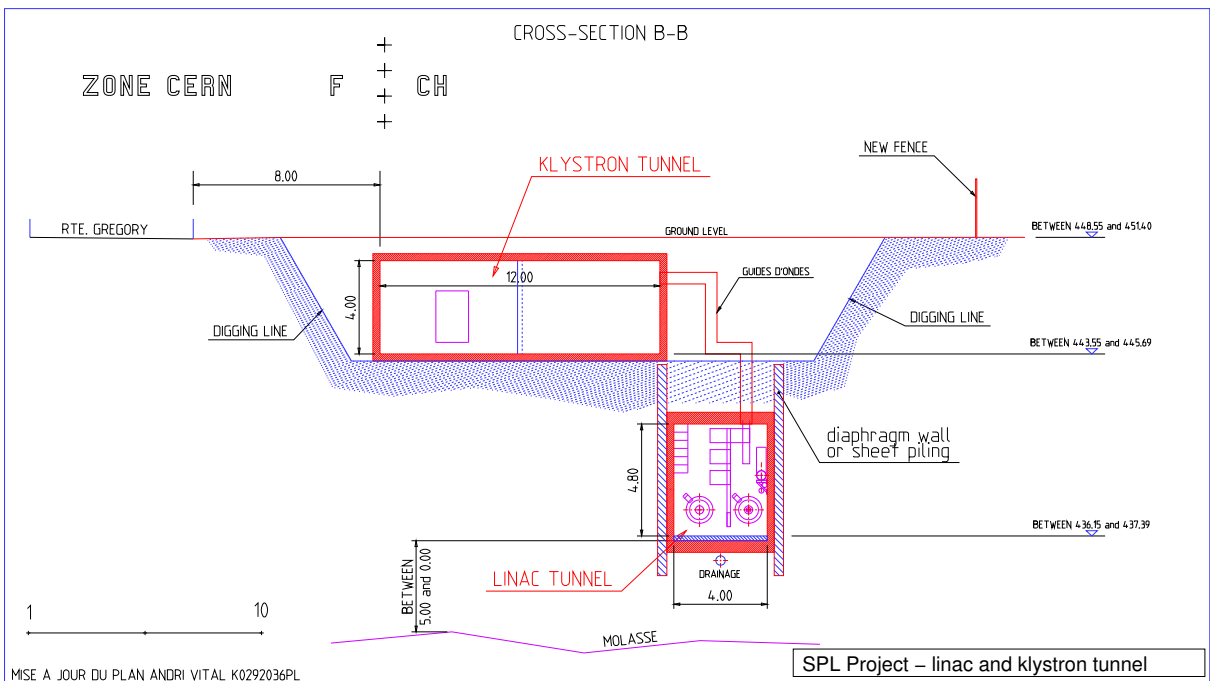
Cross-section of the linac and klystron tunnels (first 95 m)
